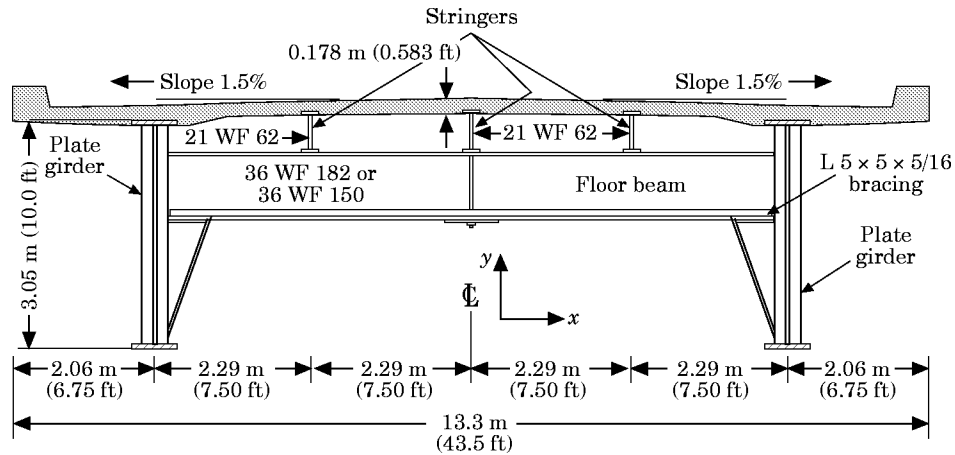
A typical cross-section geometry of the bridge: drawing not to scale.
